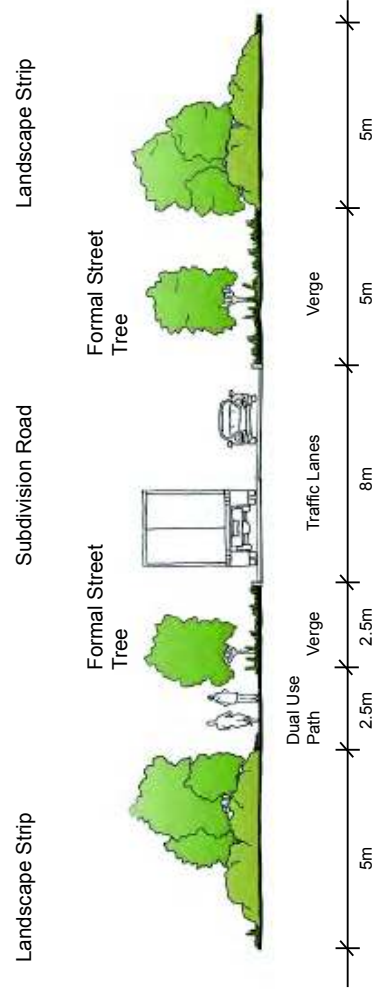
\_Typical Section\_Subdivision Road\_General Industry
